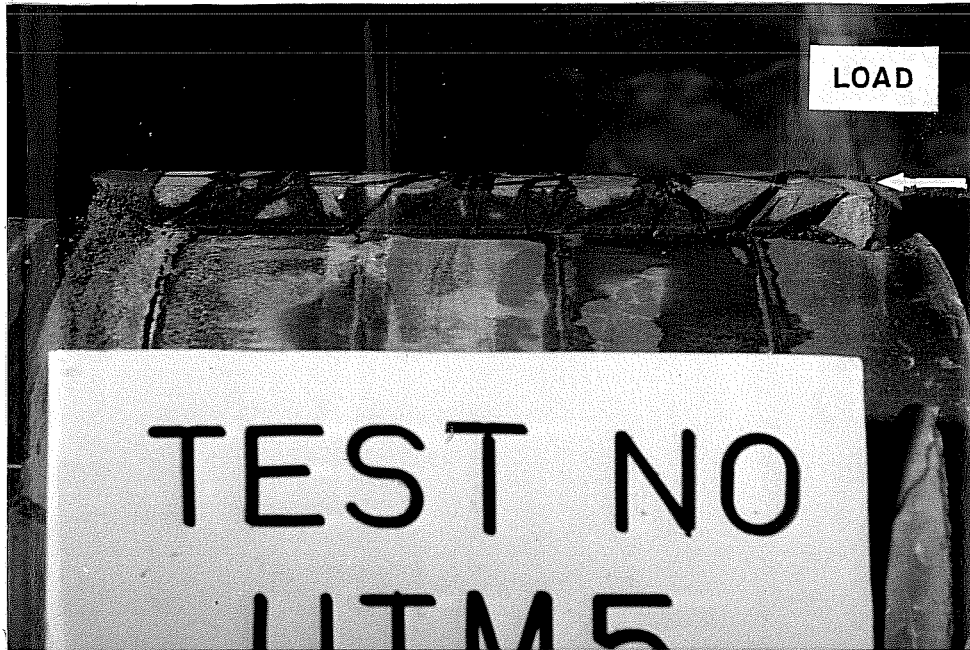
Grout profile of Specimen UTM5 showing crack pattern
